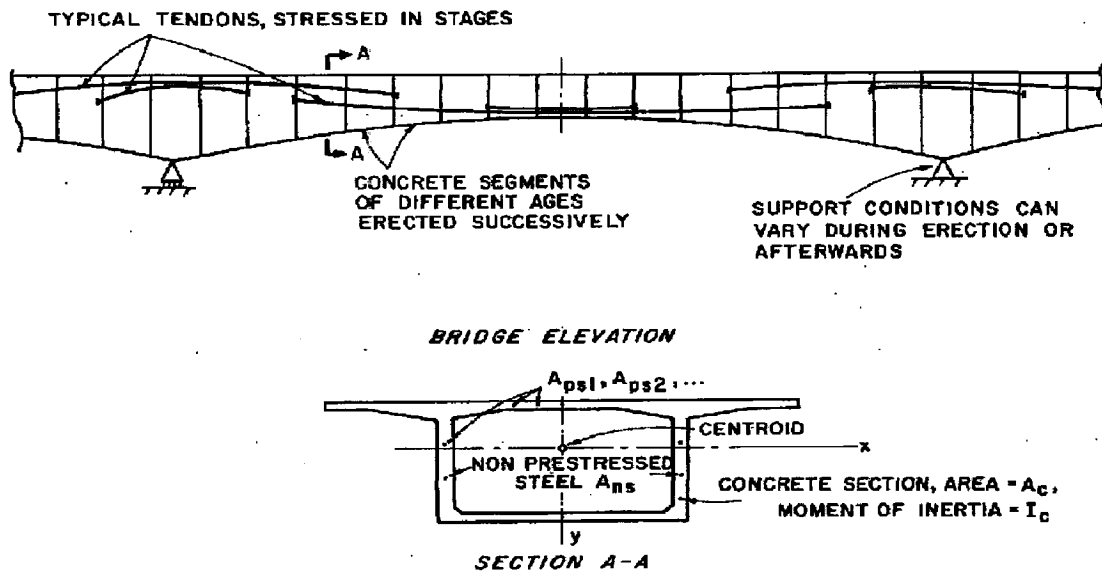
Longitudinal View and Section of Typical Segmental Bridge (Tadros et al., 1979)
